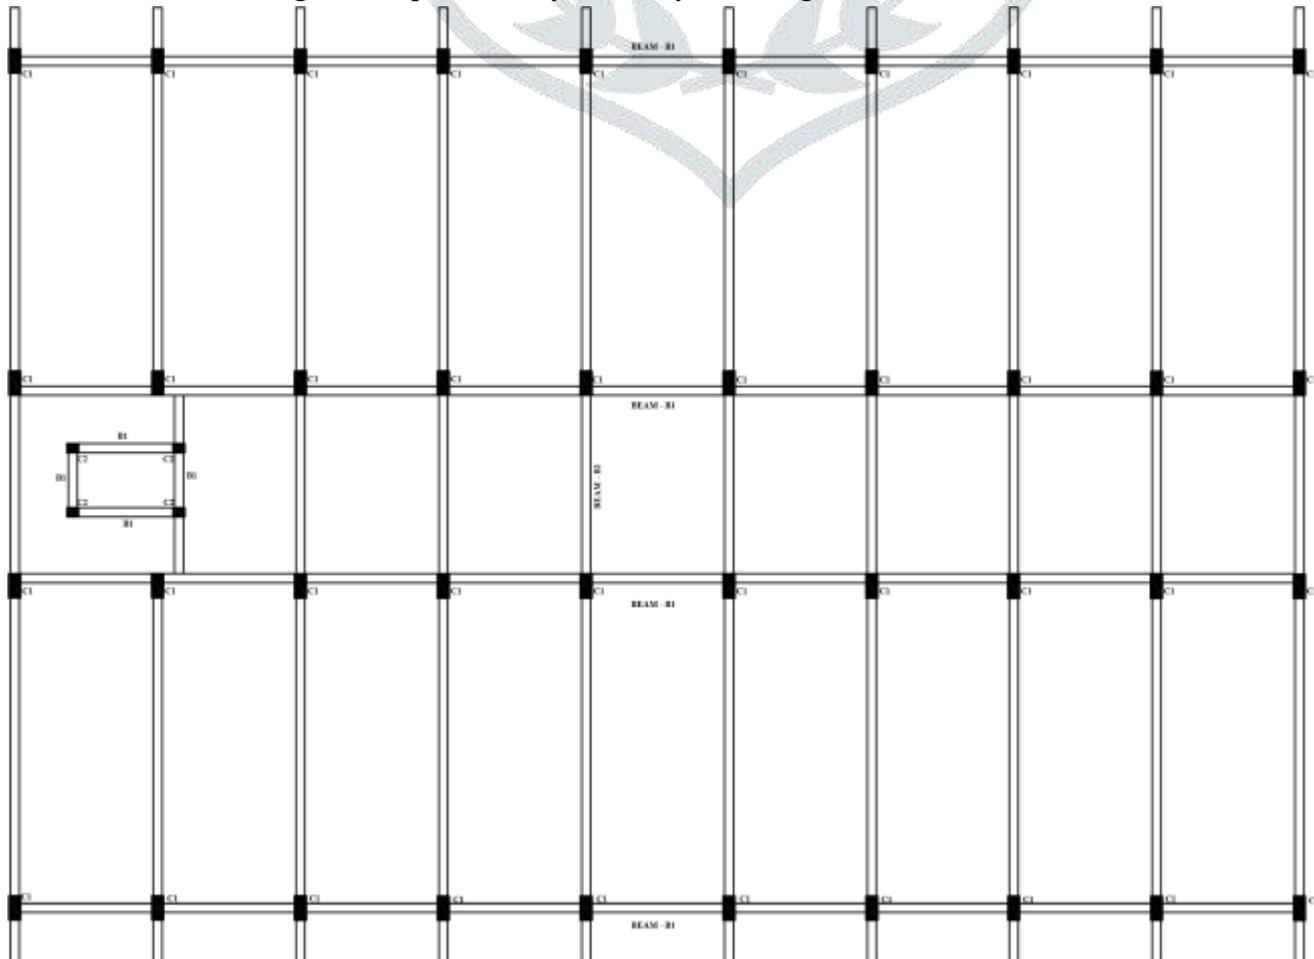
Typical Ground to Fourth Floor Beam Layout & Reinforcement Details
